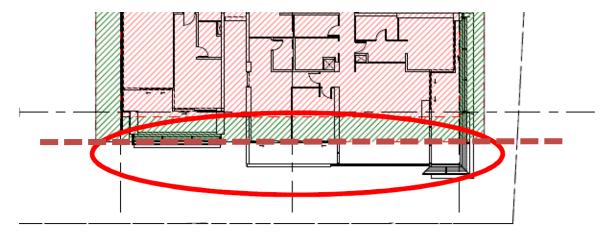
Detail showing changes between approved building envelope (dashed line) and proposed building envelope on eastern side (levels 25-66)
